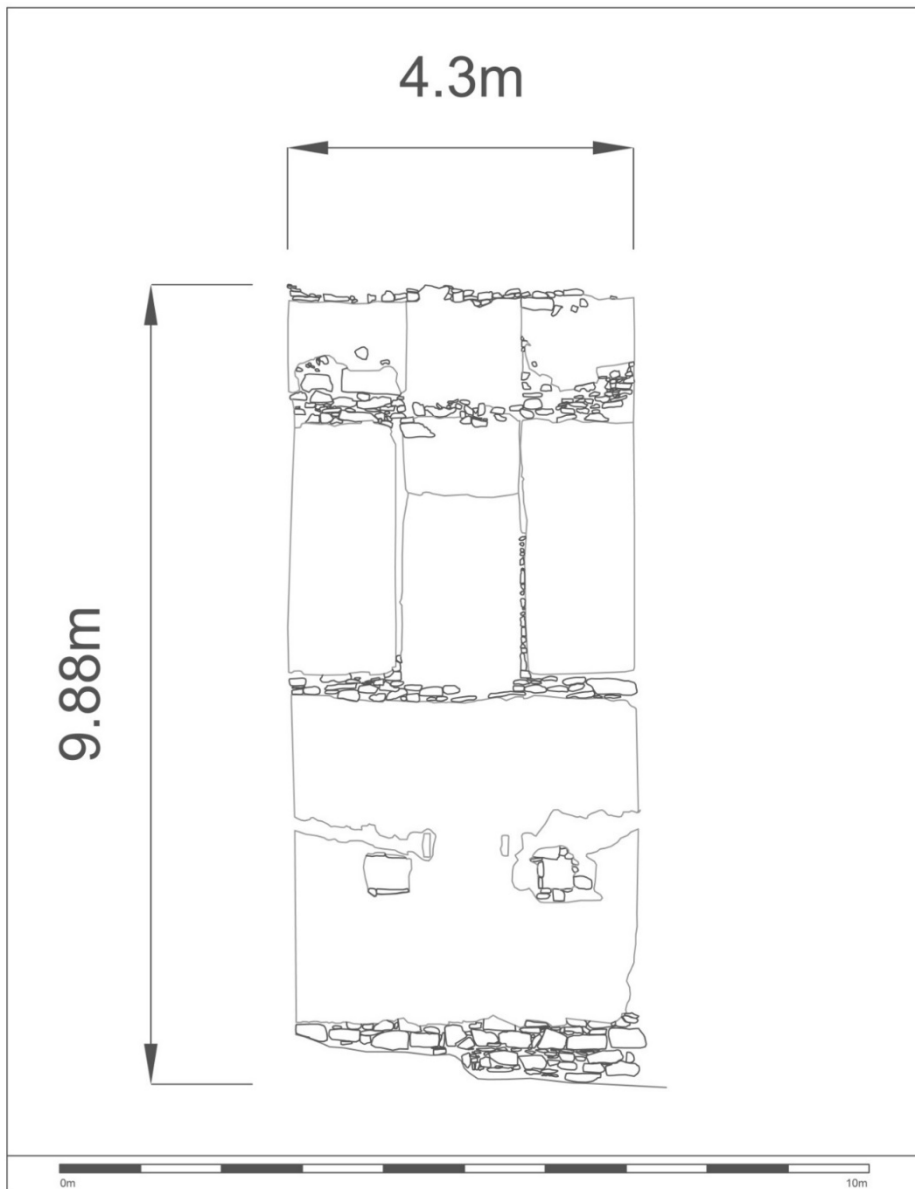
Internal elevation of the north wall of signal tower at Rathlee Signal Station.
